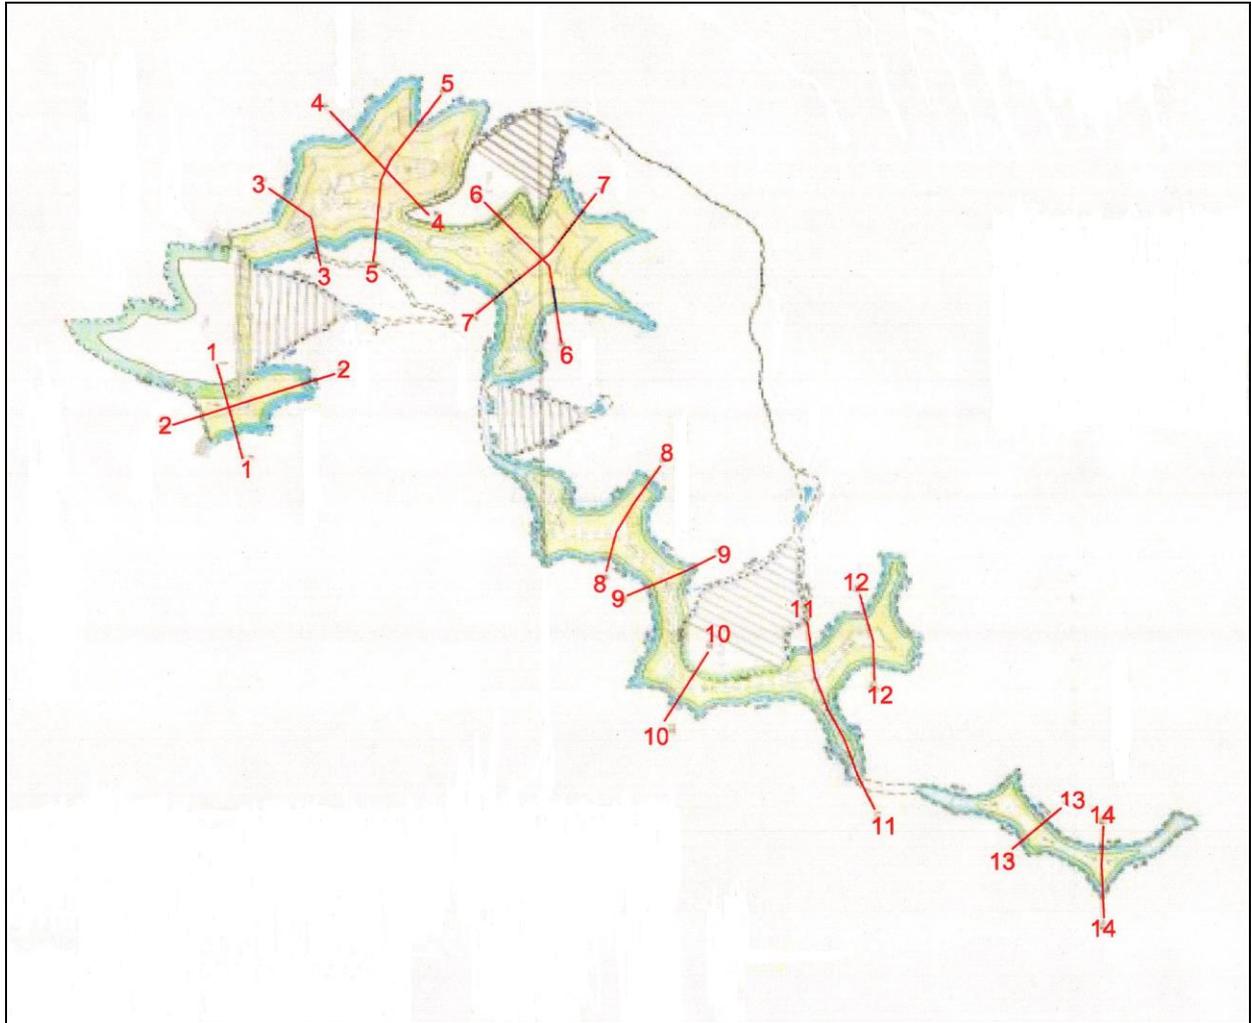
Typical Mine Grading Plan with Cross Section Locations.
